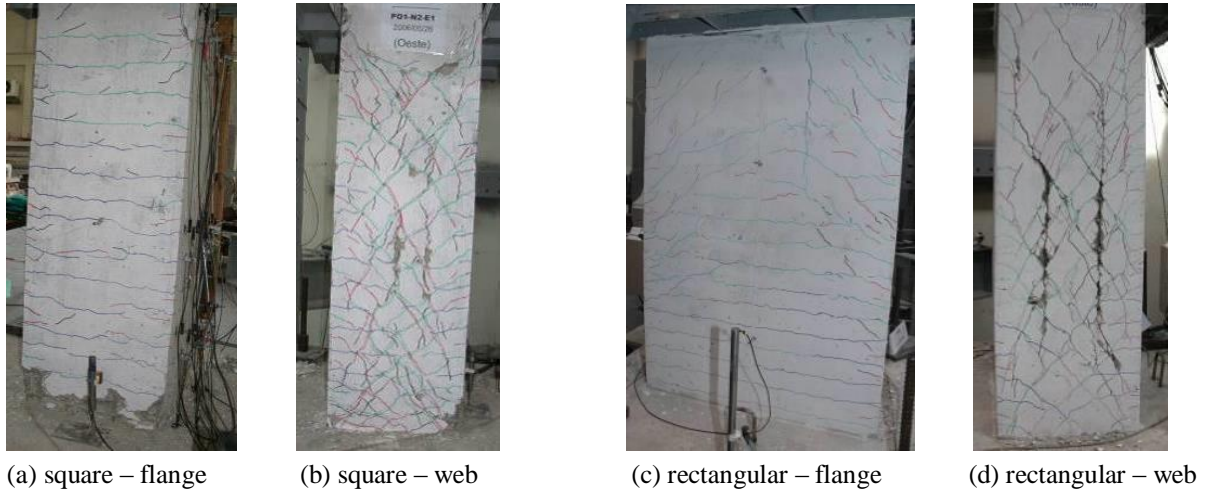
Typical final damage on the webs and flange for square and rectangular cross sections piers.
